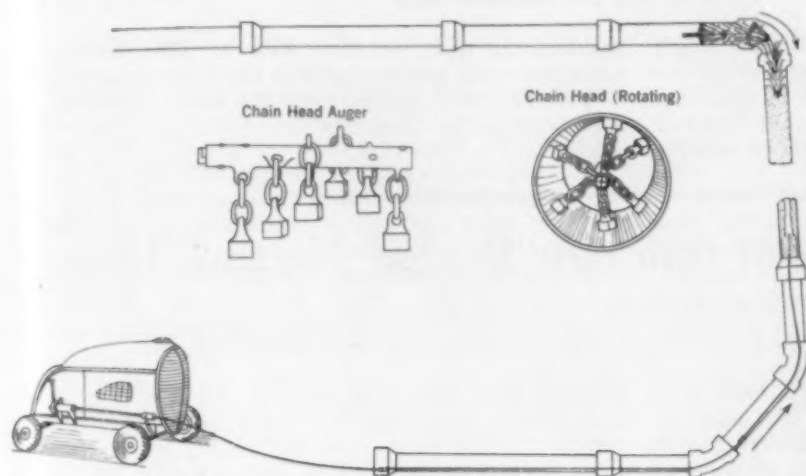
MACHINE CHAIN HEAD TOOL (CENTER)
